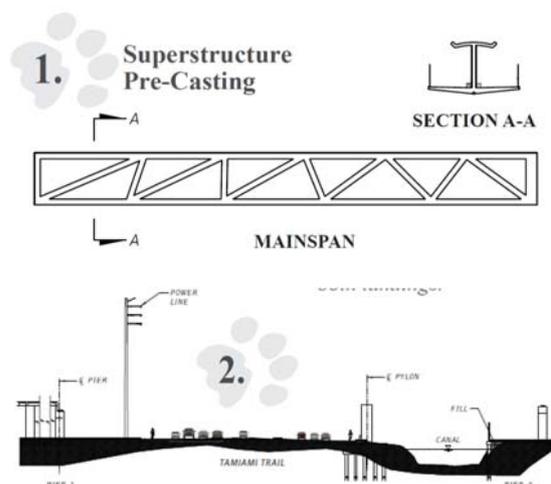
Elevation of the proposed Pedestrian Bridge at FIU
